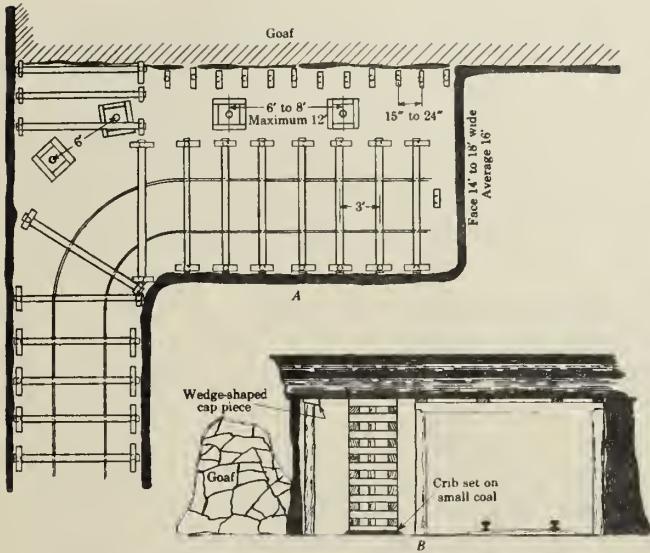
Details of timbering in pillar work. *A*, Plan of timbering; *B*, section across open end.
